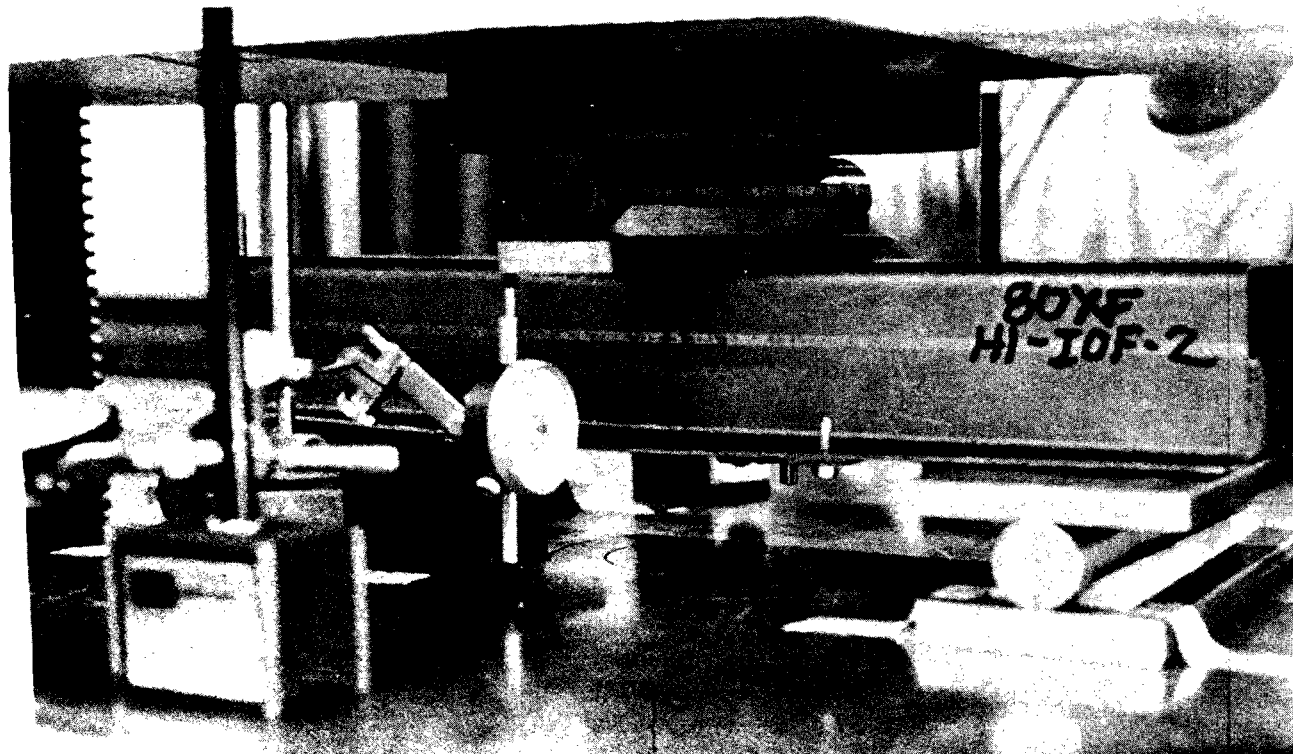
Photograph Showing Wood Blocks Were Used at Both Ends of the Hat Section Under Interior One-Flange Loading
